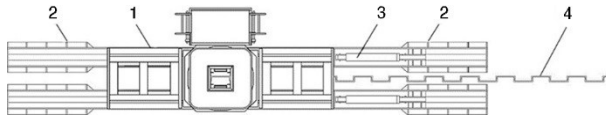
Sheet piling by the lineal method: 1 – piling machine, 2 – longitudinal guides, 3 – drive cylinders, 4 – sheet pile wall
